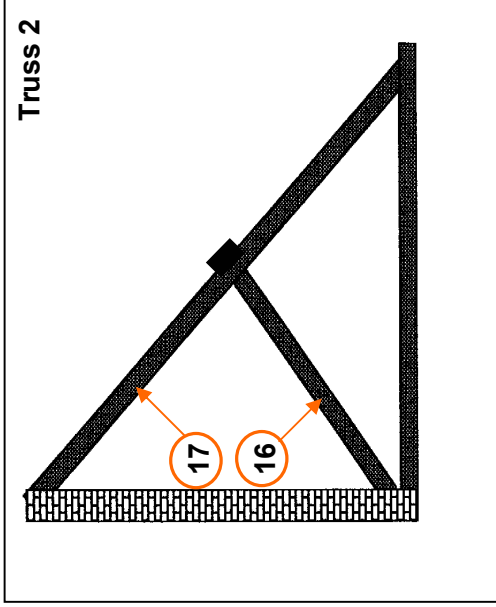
Roof trusses of the connecting range showing sample positions (trusses viewed from the south looking north)
